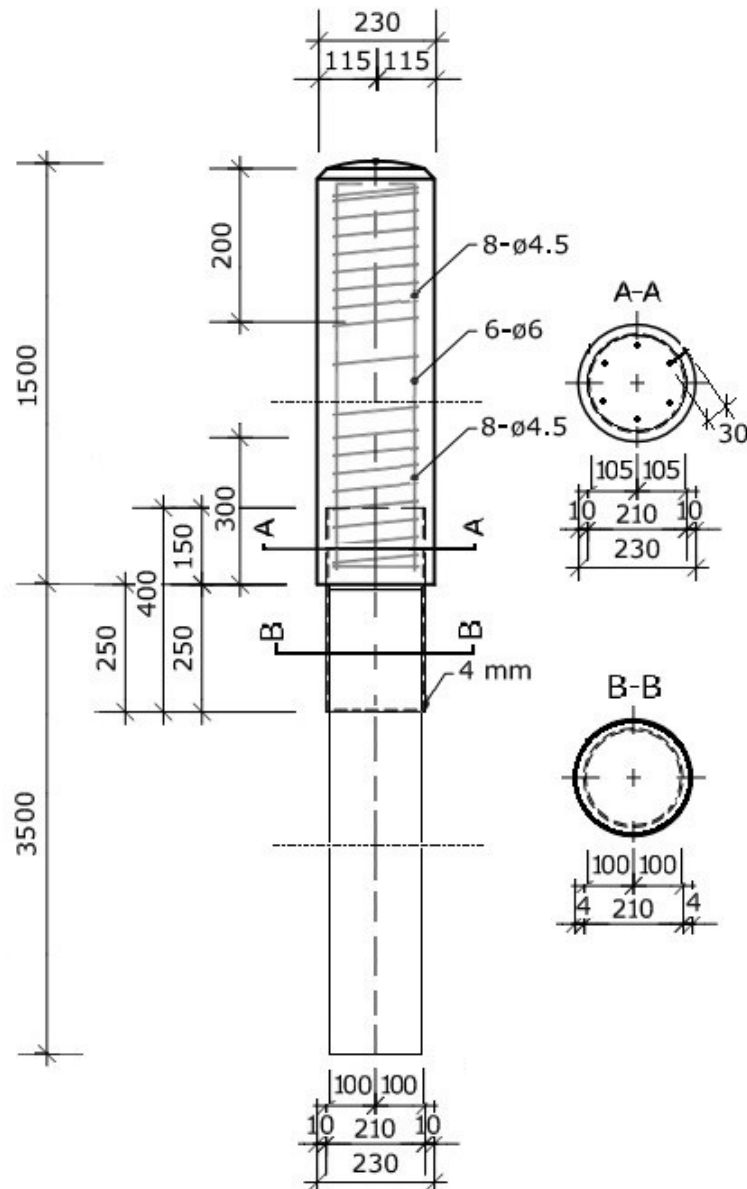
Design and dimensions of spruce timber pile with concrete cap in Zwolle
